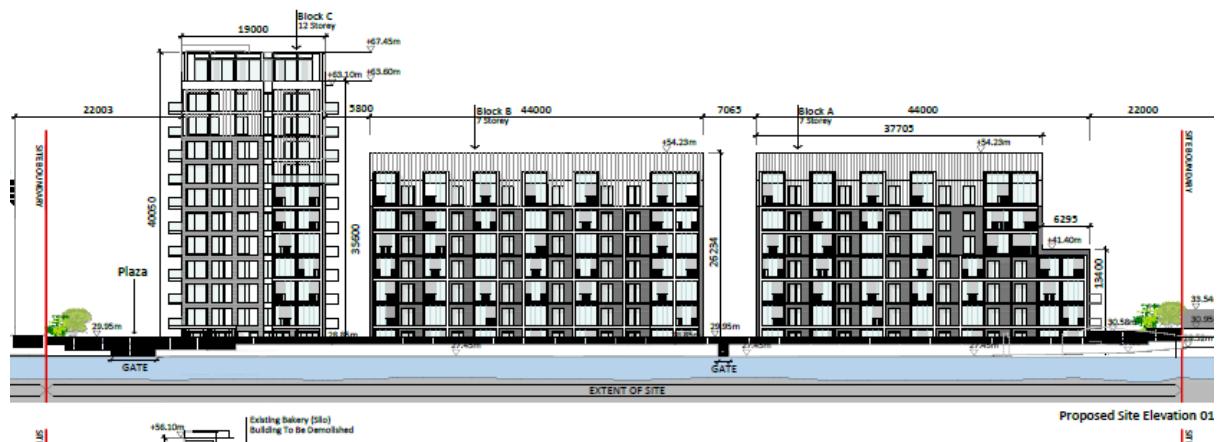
Proposed northern elevation including the alterations to the boundary wall
